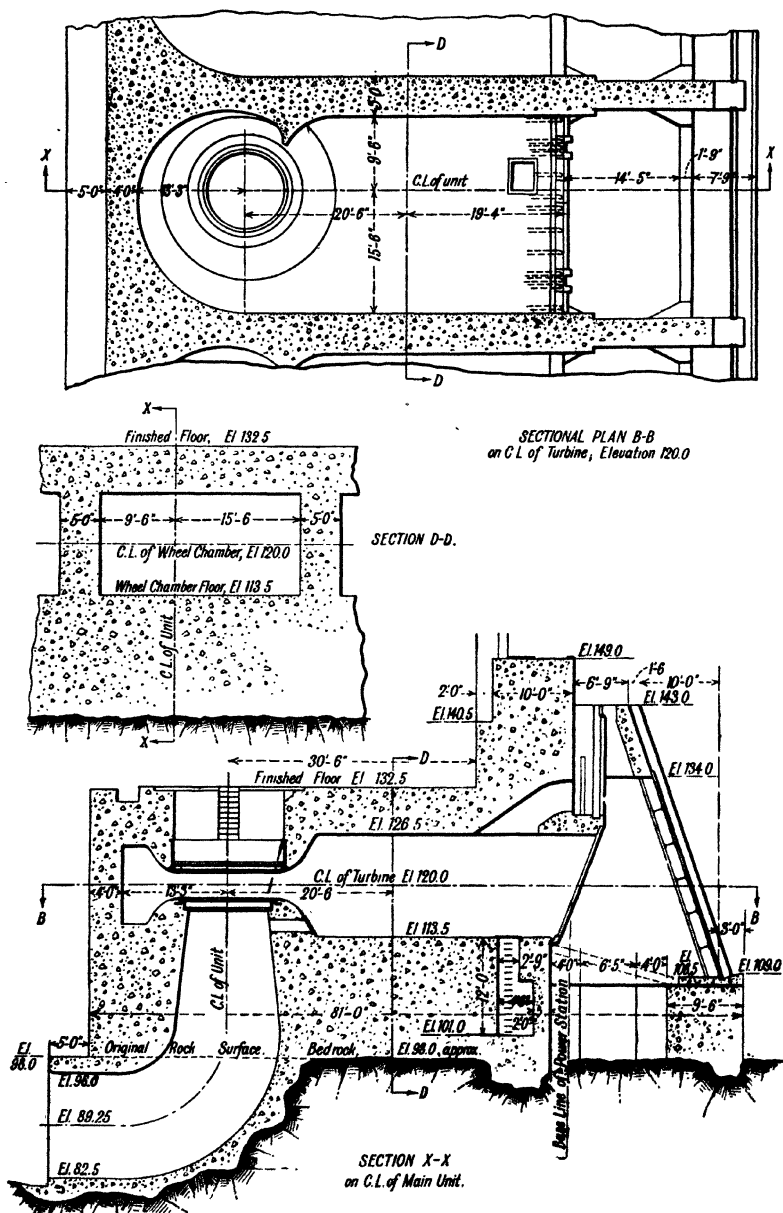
Power House Substructure of Parr Shoals Power Co.
